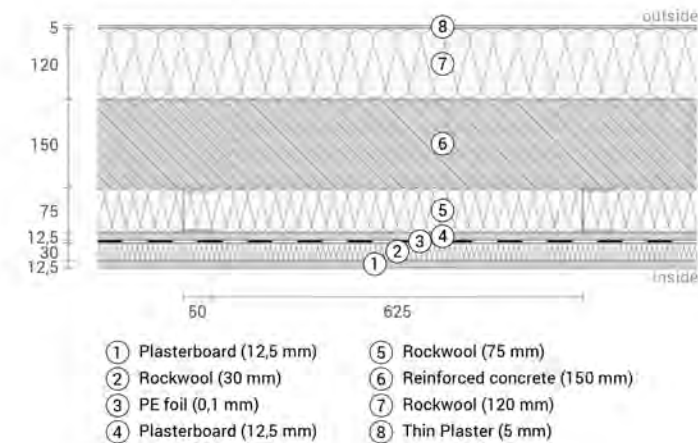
Detail of the exterior concrete wall to deck access, created by the author
